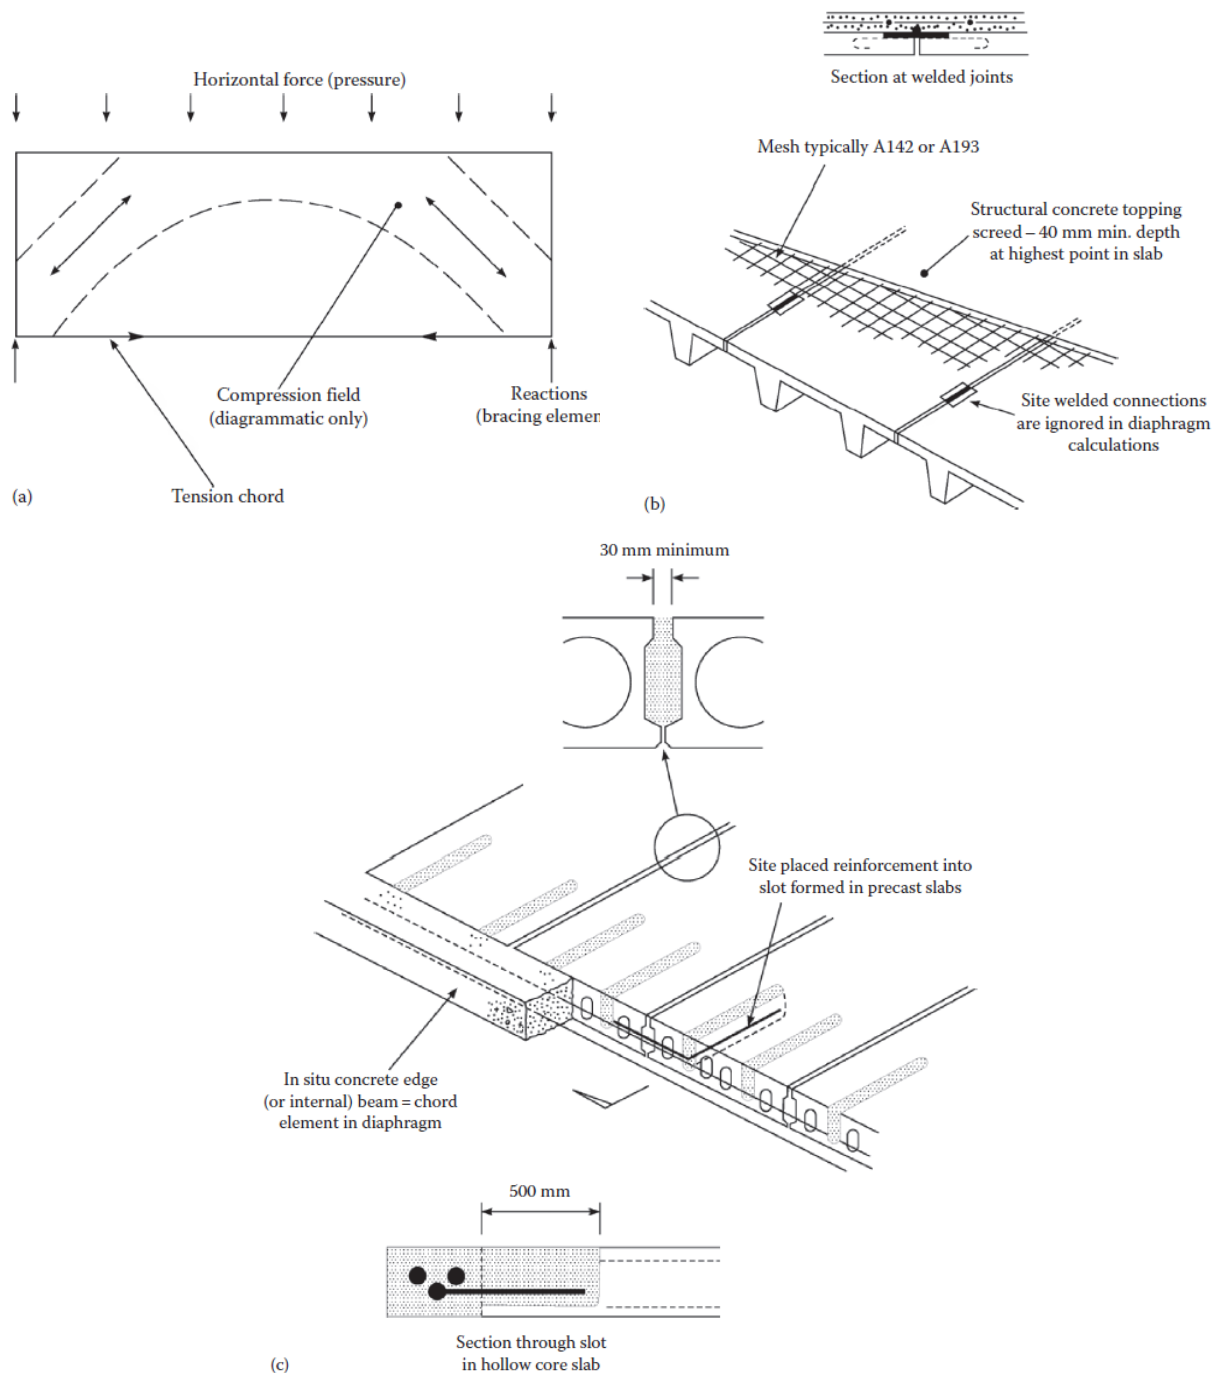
Diaphragm floor action. (a) Deep beam analogy. (b) Reinforced structural topping in double tee floors. (c) Perimeter reinforcement in hollow core floors.
